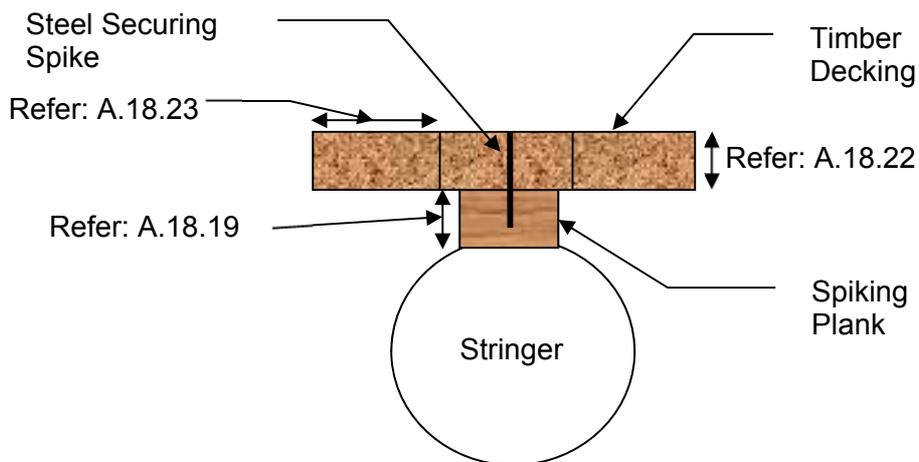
TYPICAL SPIKING PLANK AND DECKING
